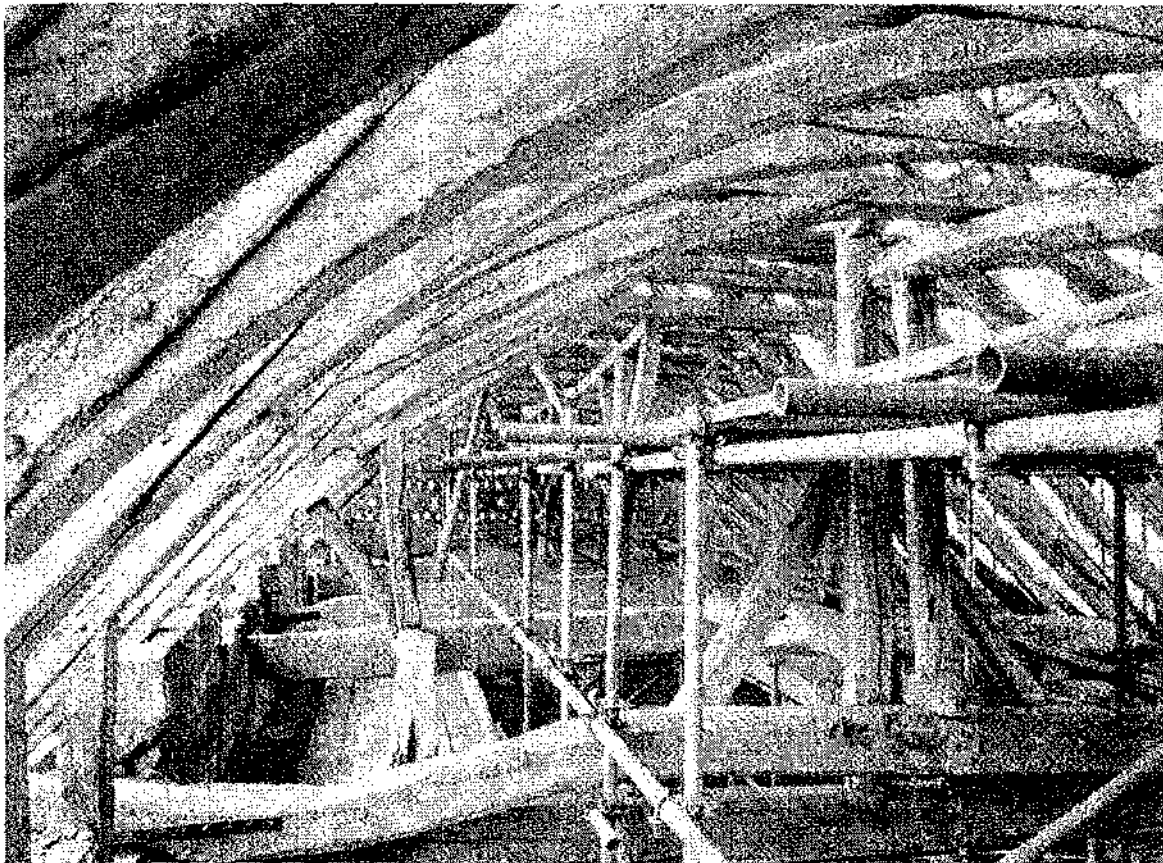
Structure 1, detail of the junction of the common-rafter roof and the crown-post roof (English Heritage).
